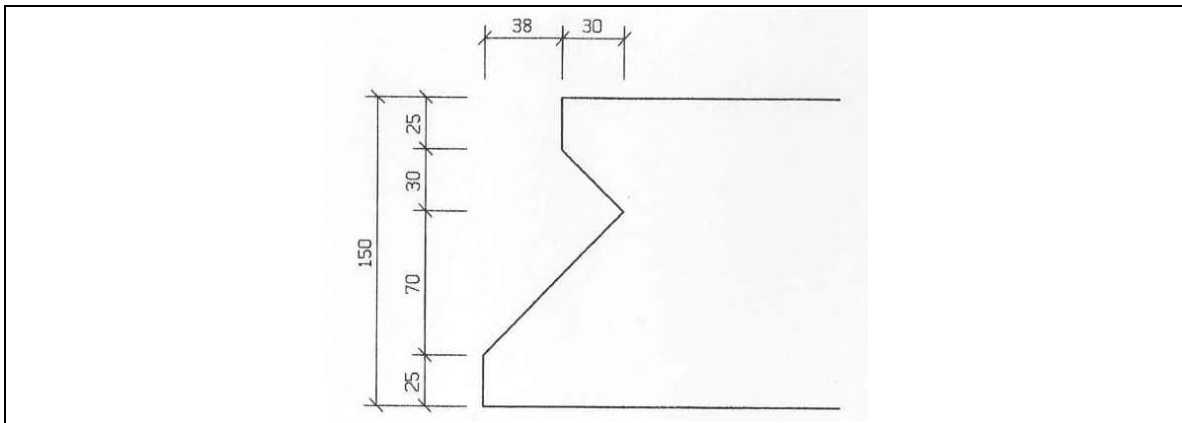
Typical keyway dimensions (NDOR, 2003)
